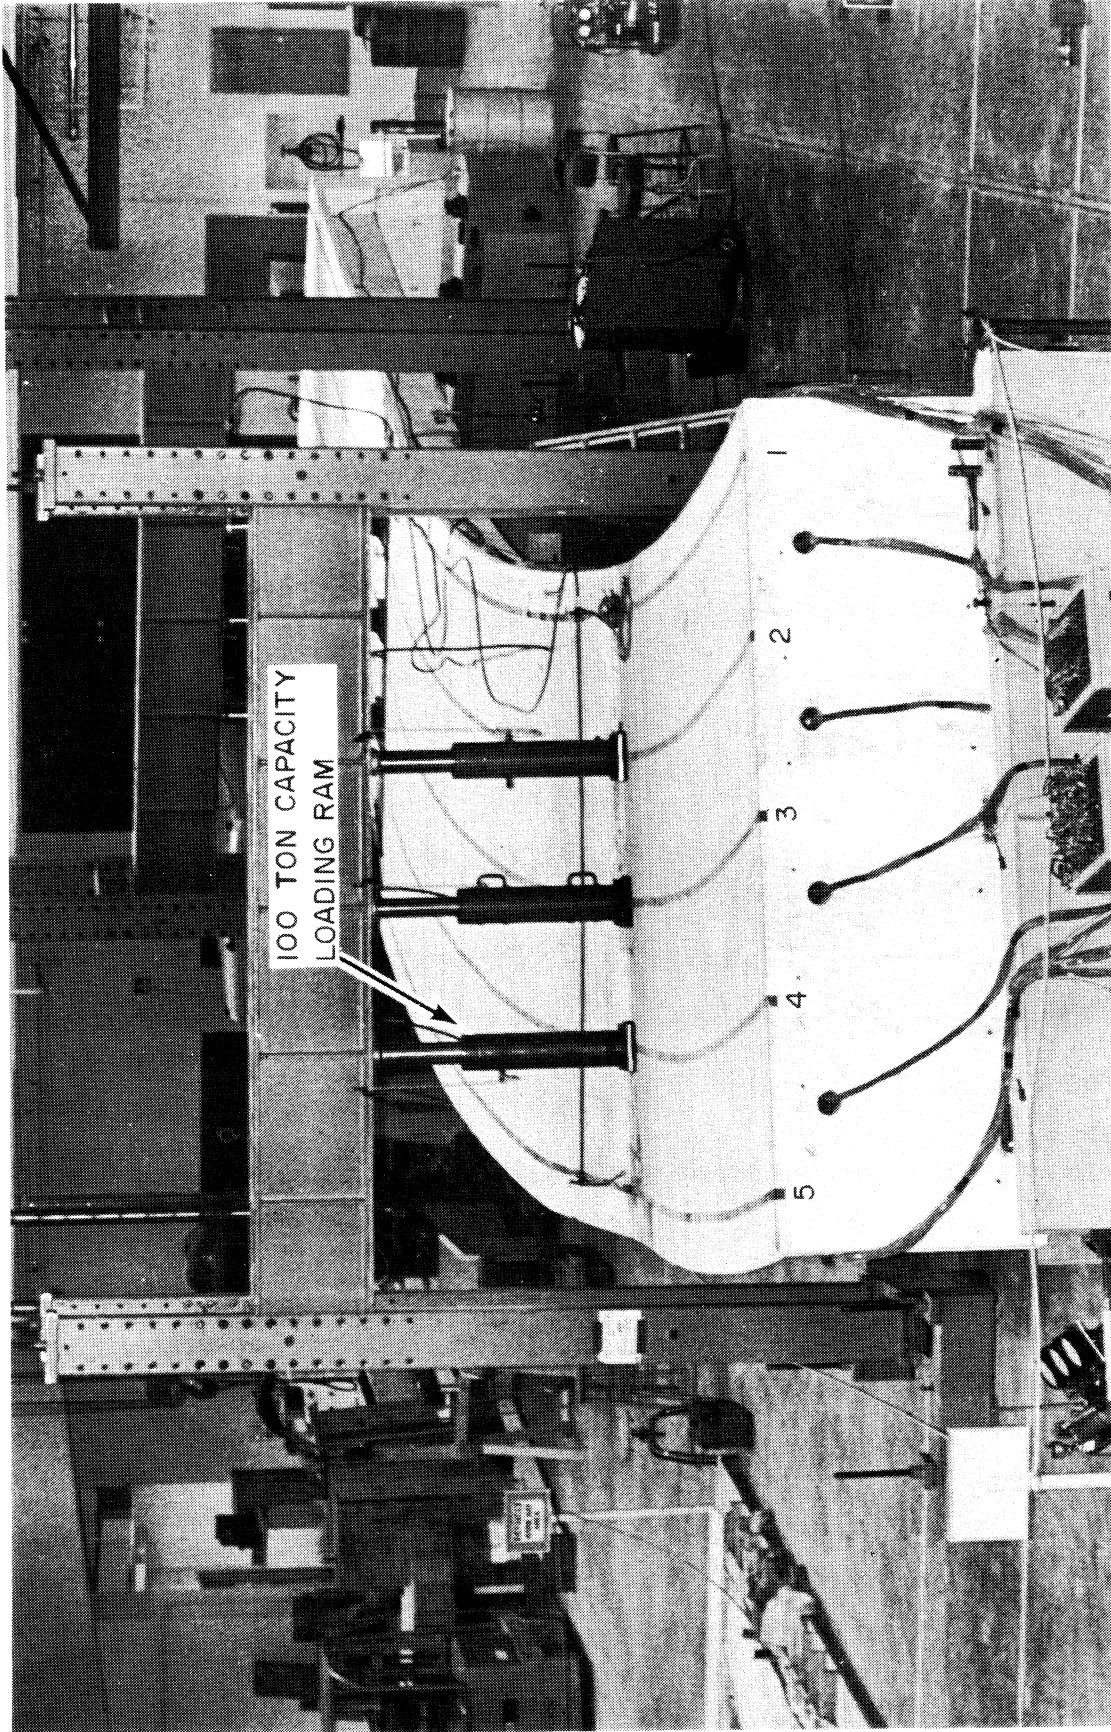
LOADING ARRANGEMENT FOR FINAL LOADING TO FAILURE WITH SIX 100 TON JACKS.
